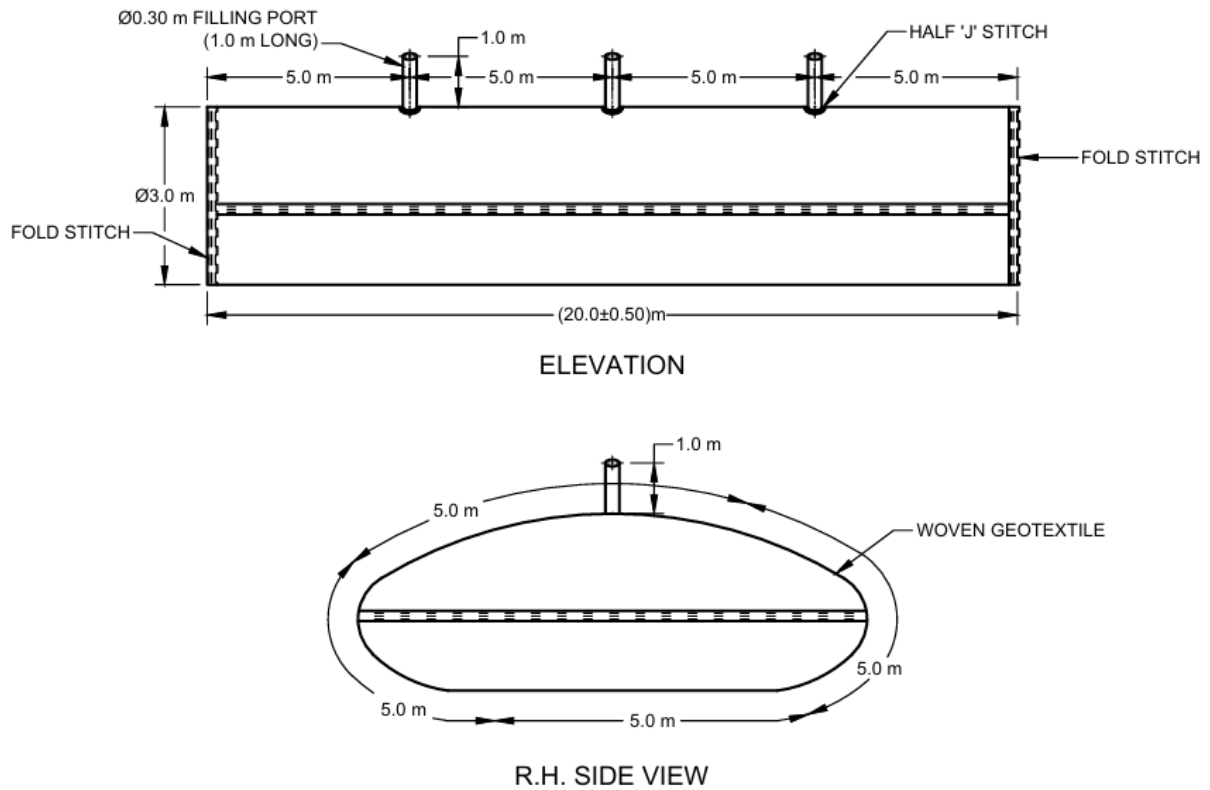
INDICATIVE SECTION OF LONGITUDINAL GEOTEXTILE TUBE OF SIZE, 20 m × 3 m
